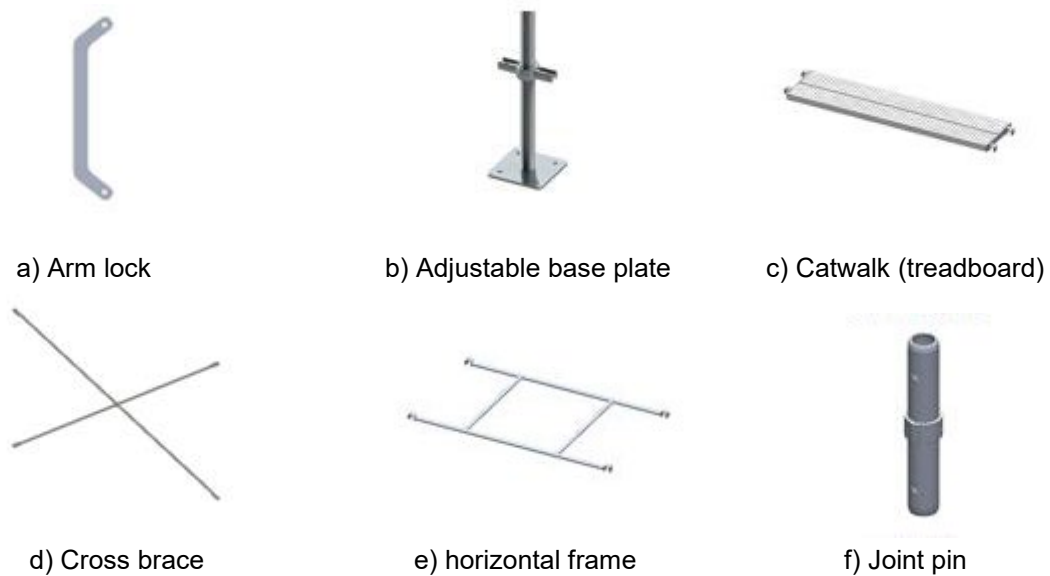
A typical prefabricated steel frame scaffolding assembly⁶
